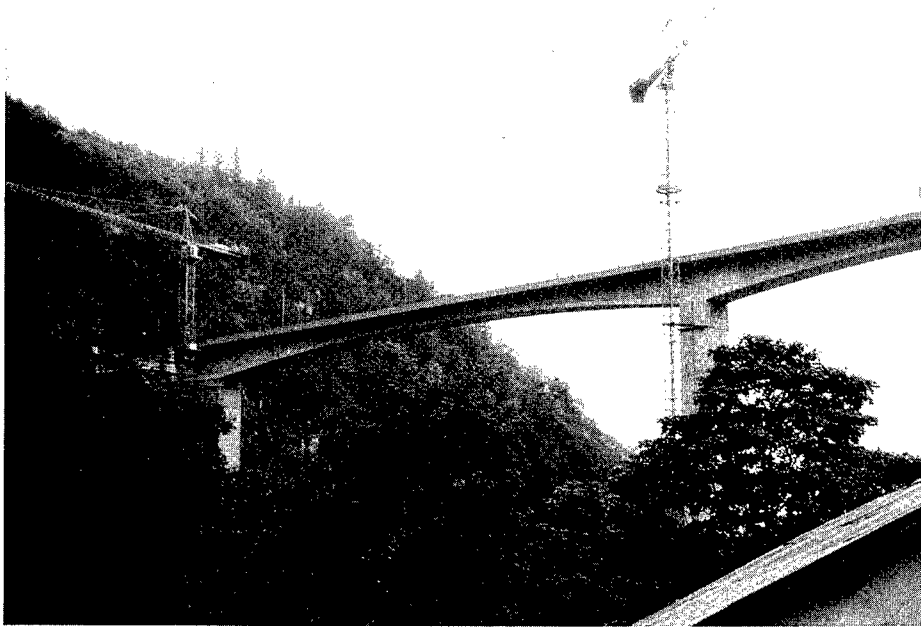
Bridge construction, route A-15, Brandenburg. Note cantilevered form supports —no vertical falsework.
